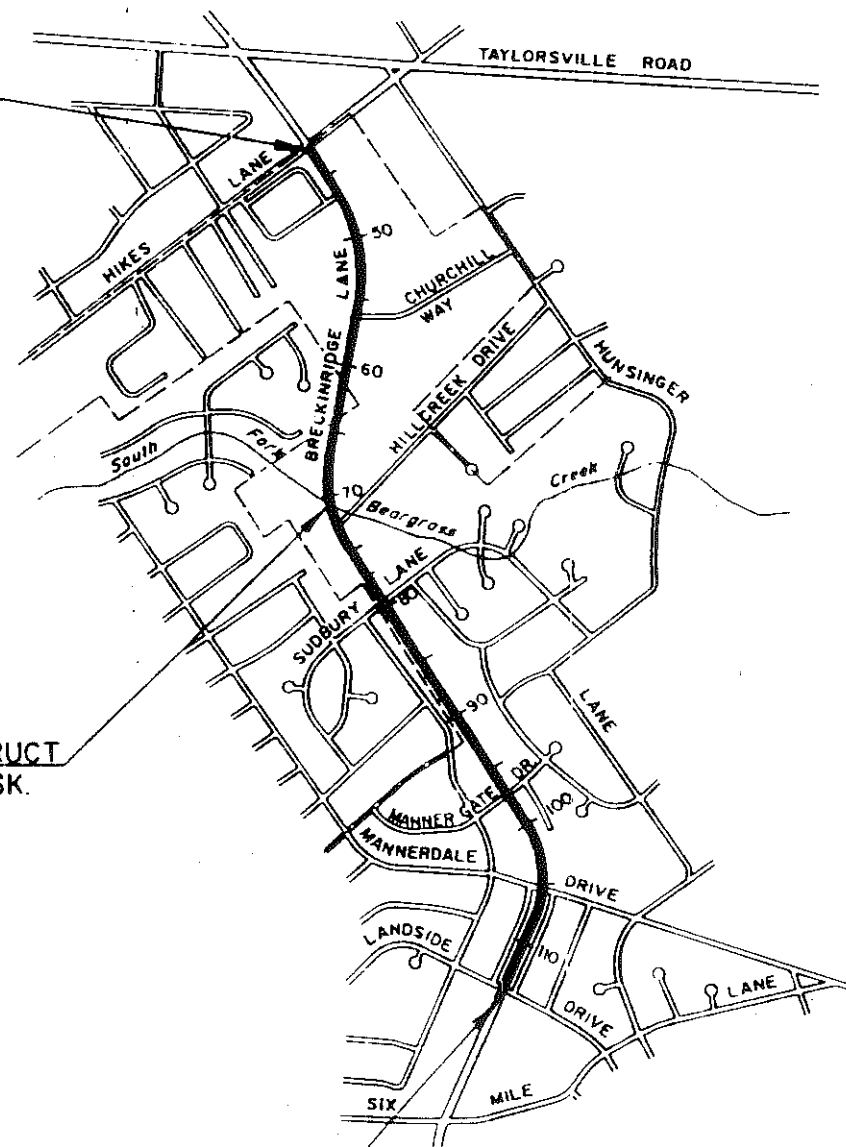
Location of Site 1 at Breckenridge Lane in Louisville.
